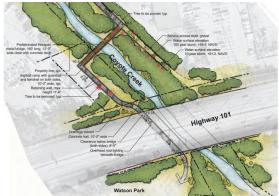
Drawing from the 2011 Coyote Creek Trail Master Plan
